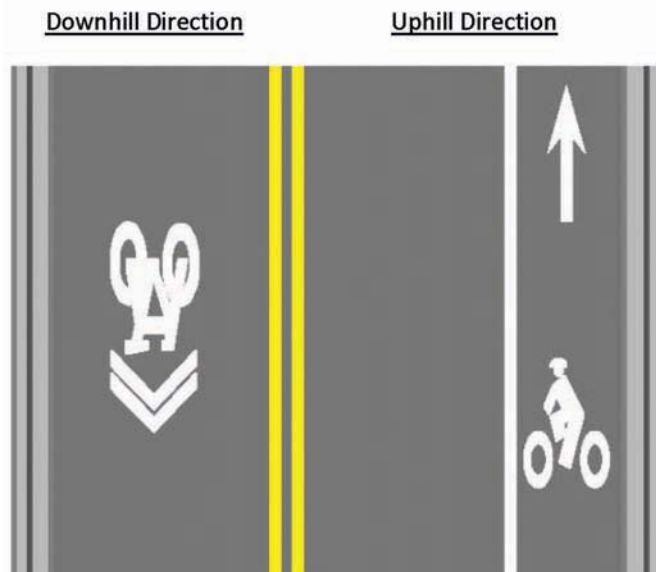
Shared-Lane Marking and Bike Lane on Steep Street
